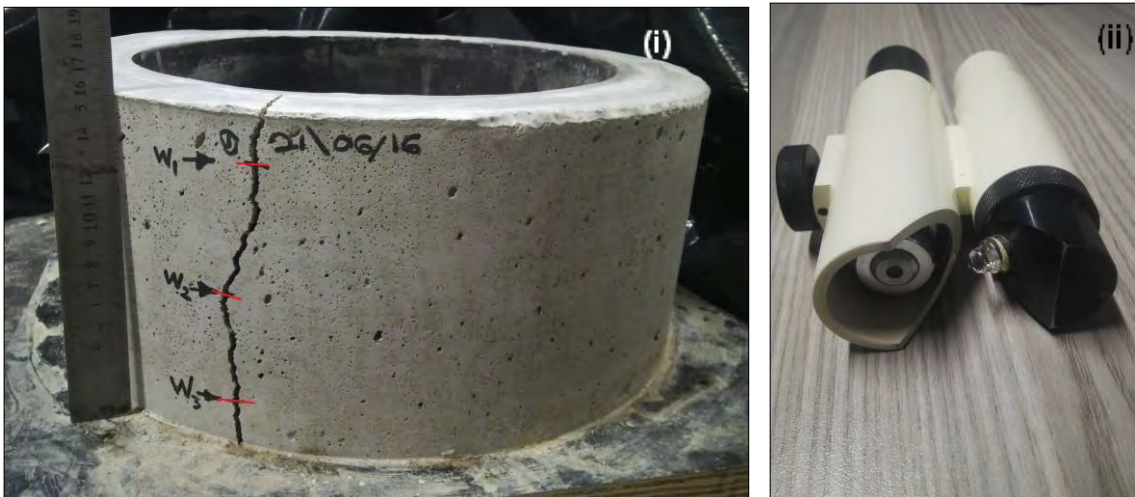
A ring specimen showing crack width measuring points and a hand microscope.
